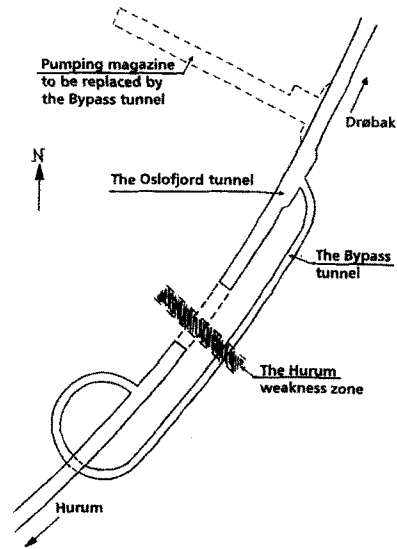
The bypass tunnel, crossing the Hurum weakness zone at a lower elevation
